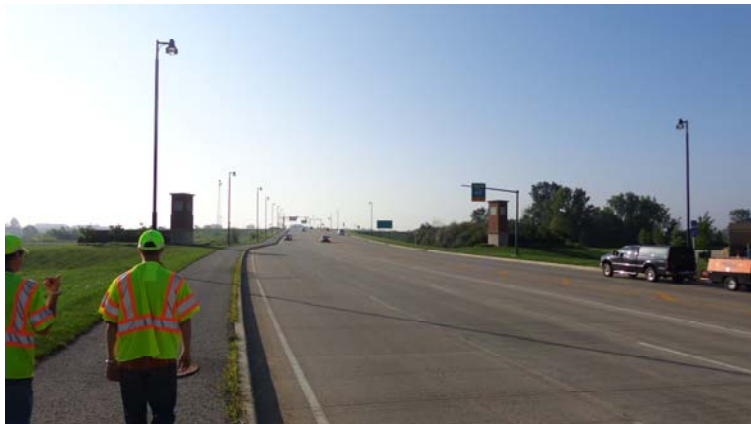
View of Campus Parkway (facing southeast; September 4, 2014).
